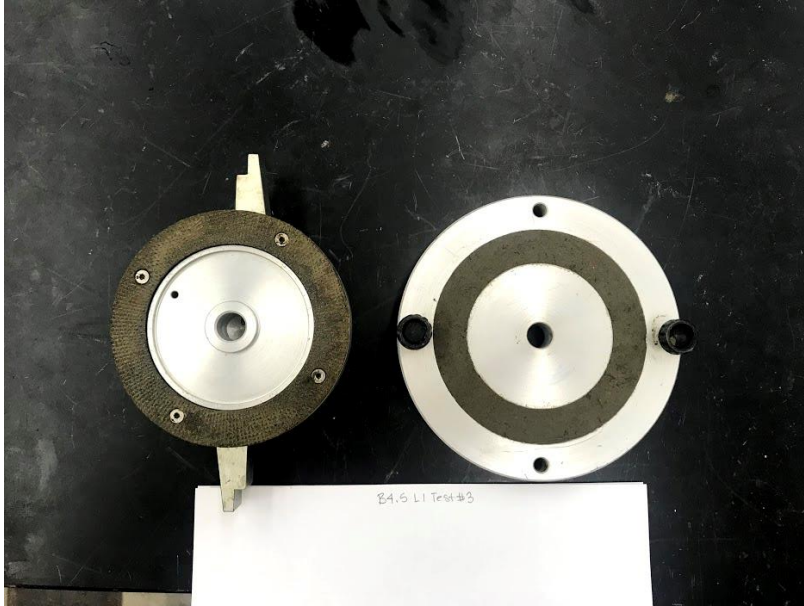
Stress Level #3 Specimen for Paved Shoulders (B4.5)
